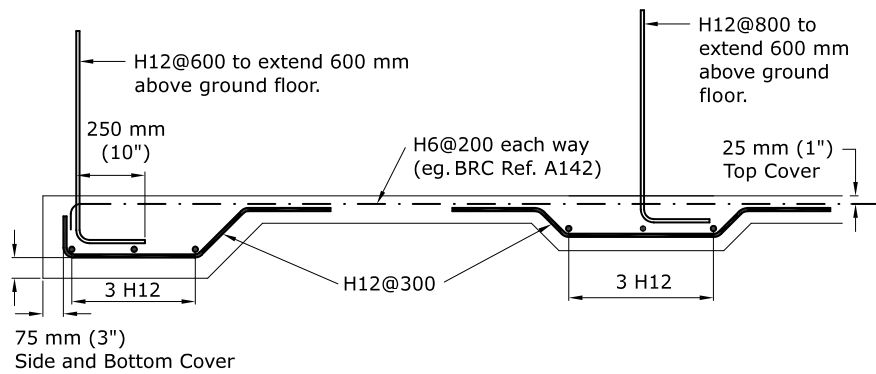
REBAR LAYOUT OF SLAB-ON-GROUND FOOTING (MASONRY WALLS)
